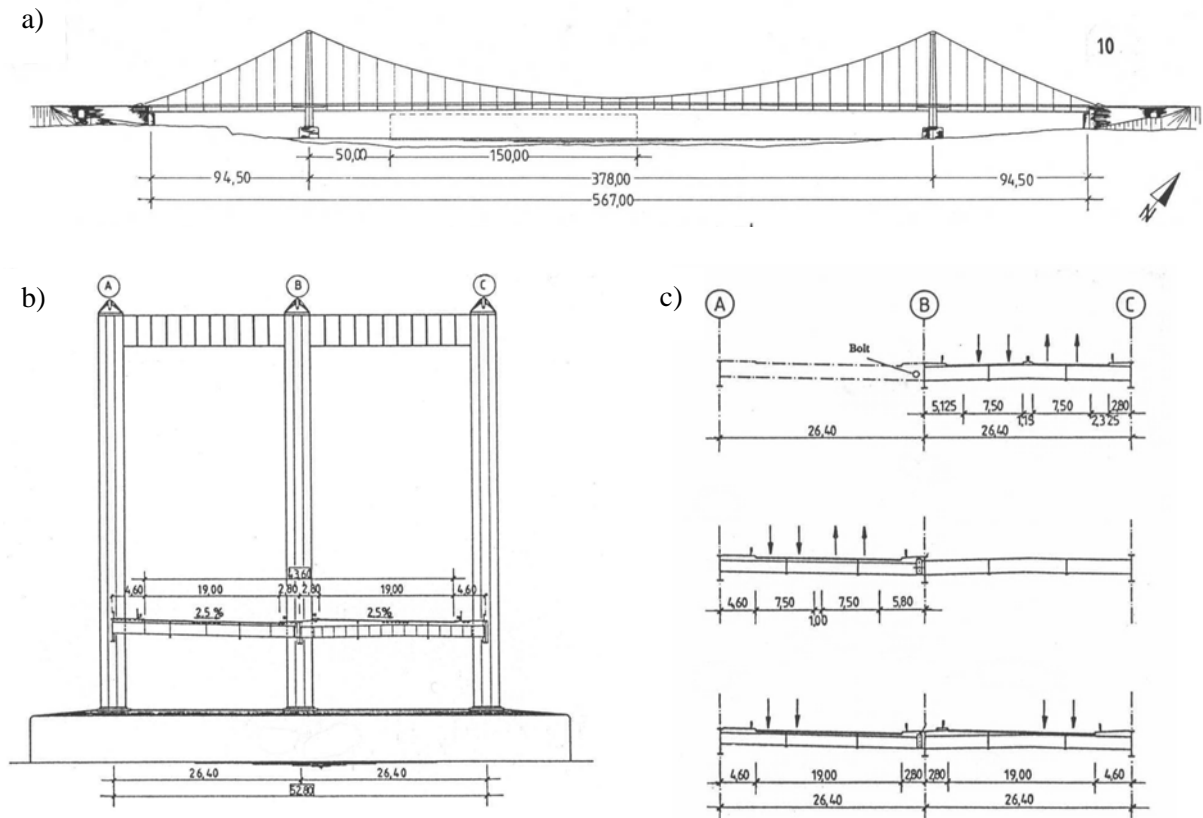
Köln-Rodenkirchen Bridge, a) Layout, b) Tower, c) Construction Sequence
